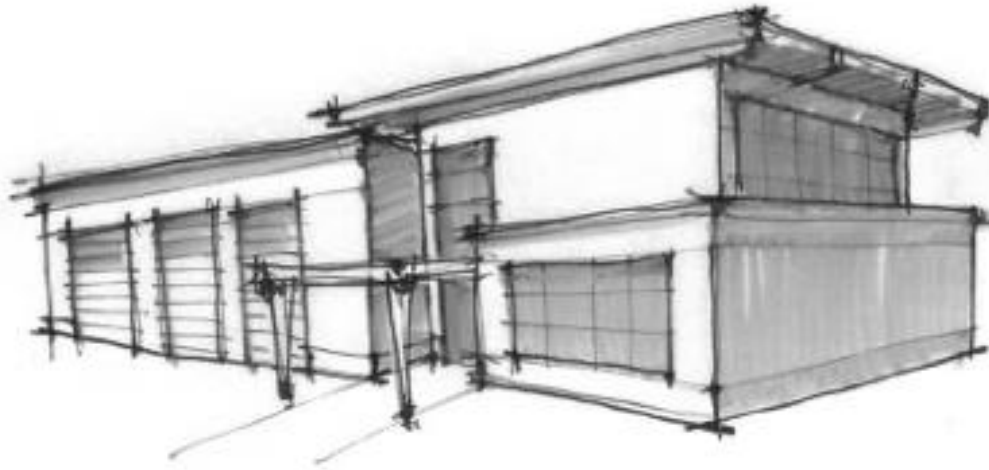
Site Plan Sketch of Potential New Greenwood Fire Hall on City-owned Site¹⁸
